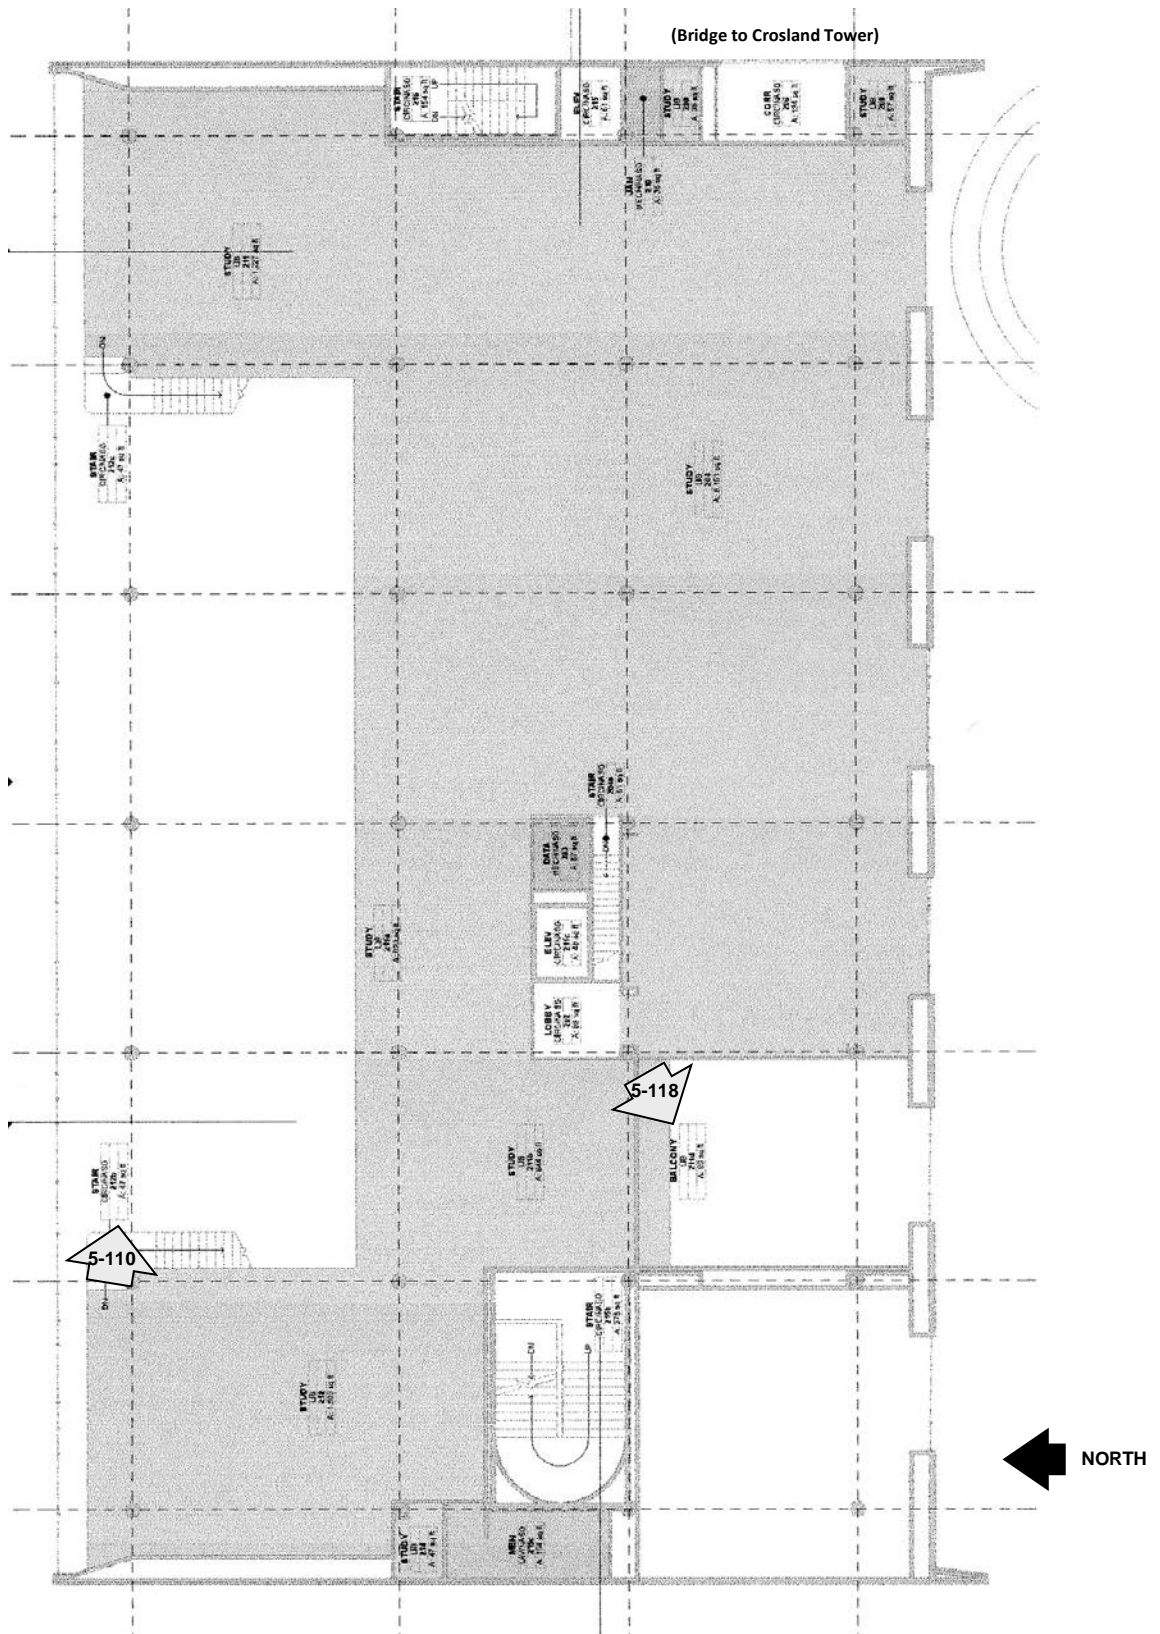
PHOTO KEY – FIRST FLOOR PHOTOS TAKEN FROM SECOND FLOOR
